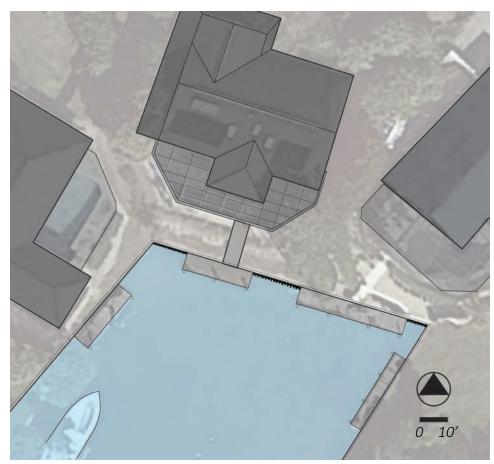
Site plan for the Fort Pierce installation. Panels were placed on an aluminum seawall at the end of a canal.
